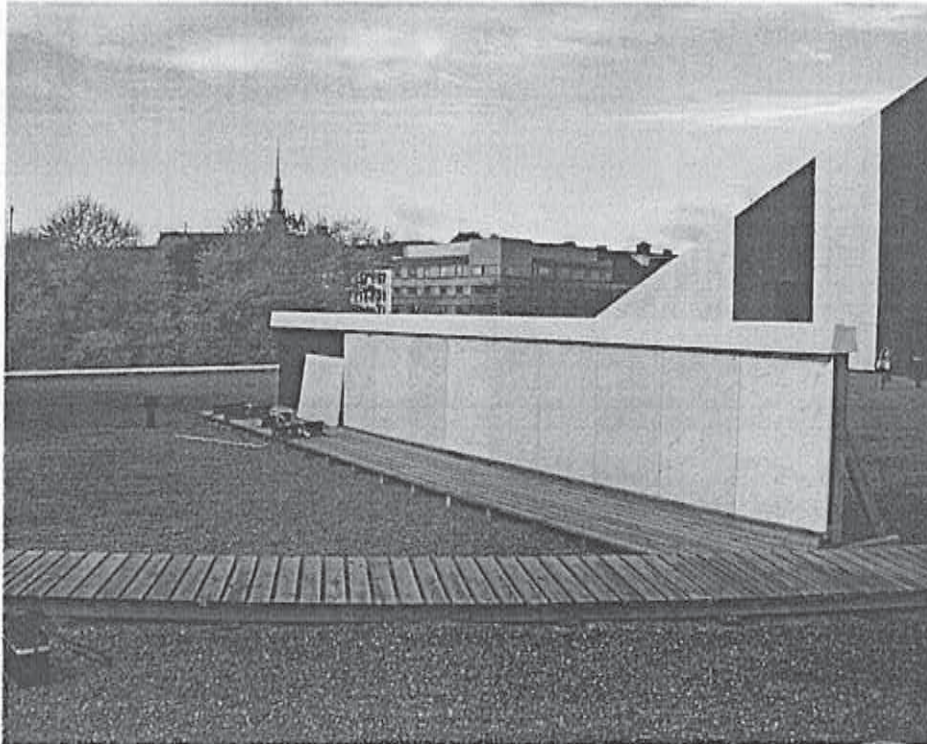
Laboratory test samples on the roof of Finlandia Hall
